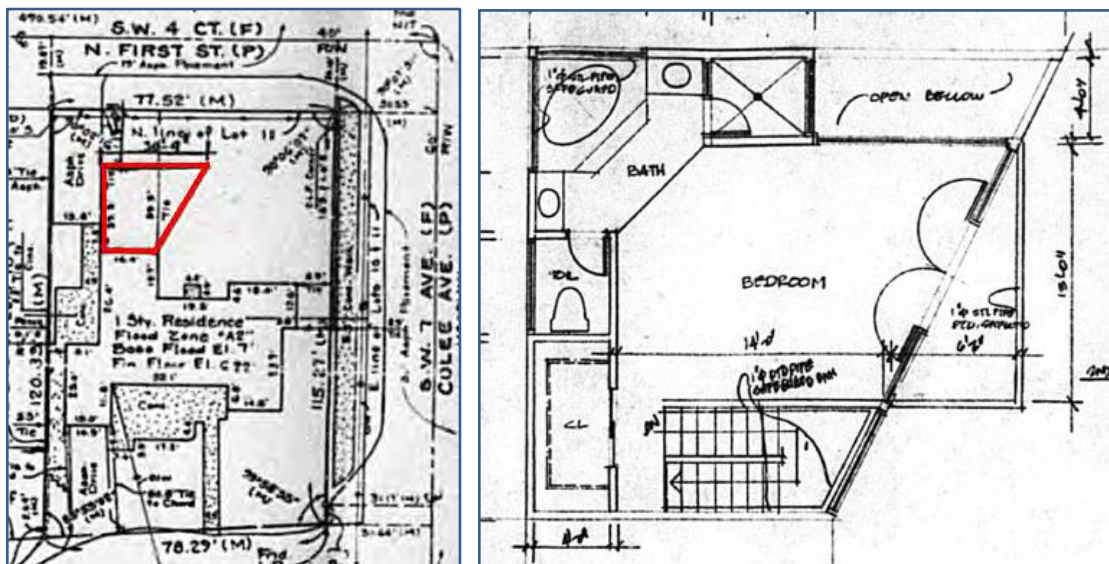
1993 Second Floor Addition Site and Floor Plans
